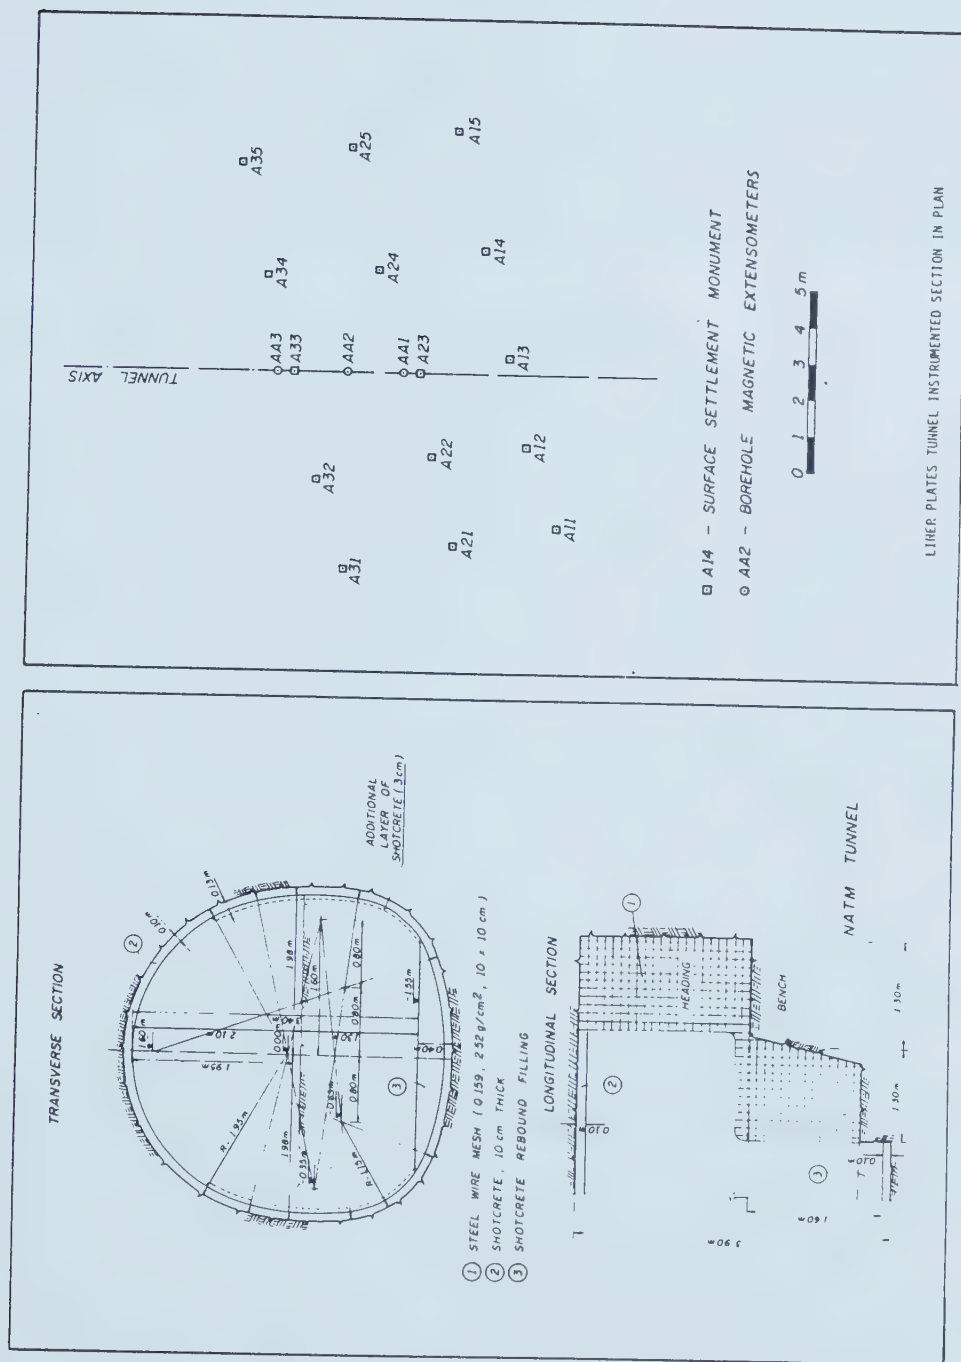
Sequential Tunneling Technique and a Typical Instrumented Section
